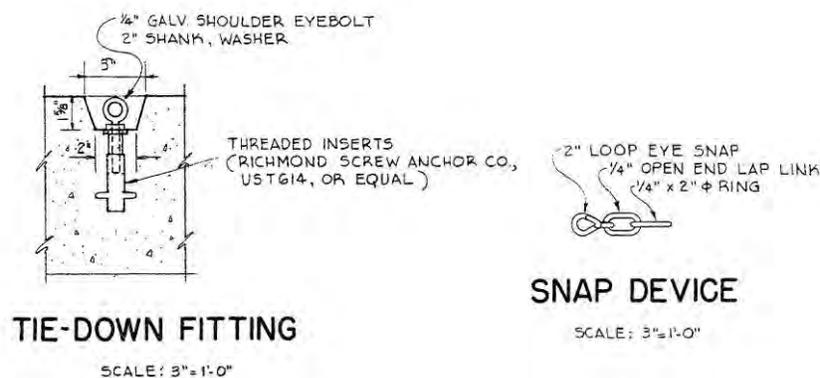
C-124 concrete mock-up for air movement training, snap device and tie-down fitting details, 1951 (standard drawing 2-13-60 sheet 1; C-124 mock-up for air movement training, concrete plan, sections, and details; 7 December 1951). (NARA College Park, RG 111-SC WWII, box 241, photo SC413207).
